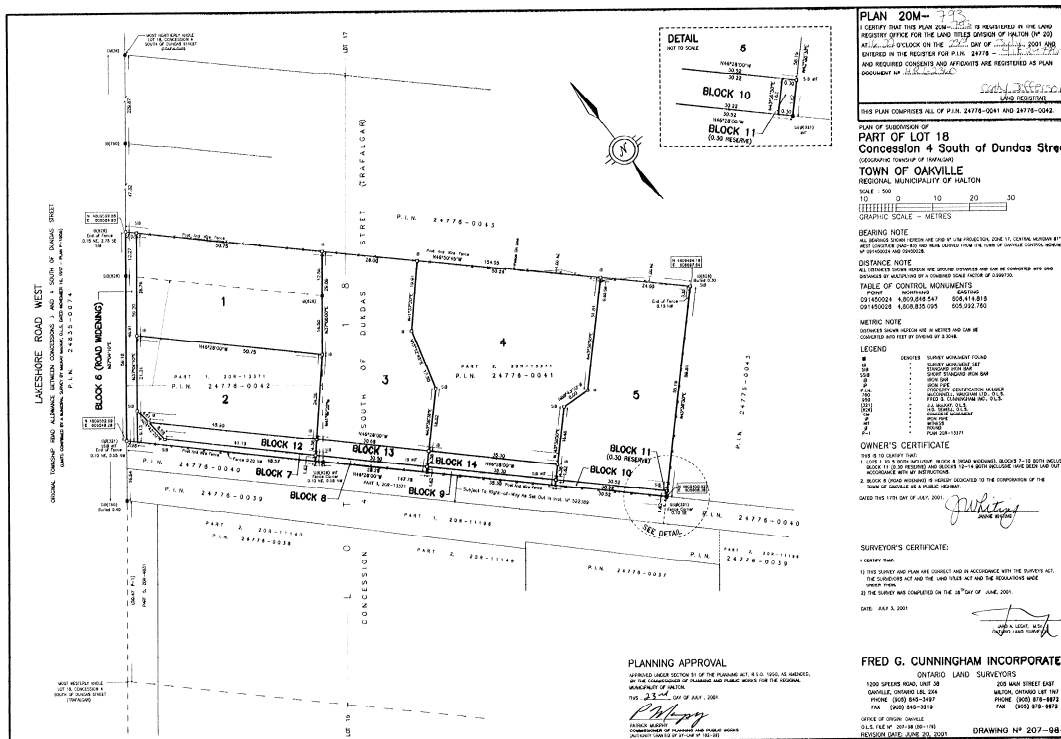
Lakeshore Road West Plan of Subdivision 20M-00793
